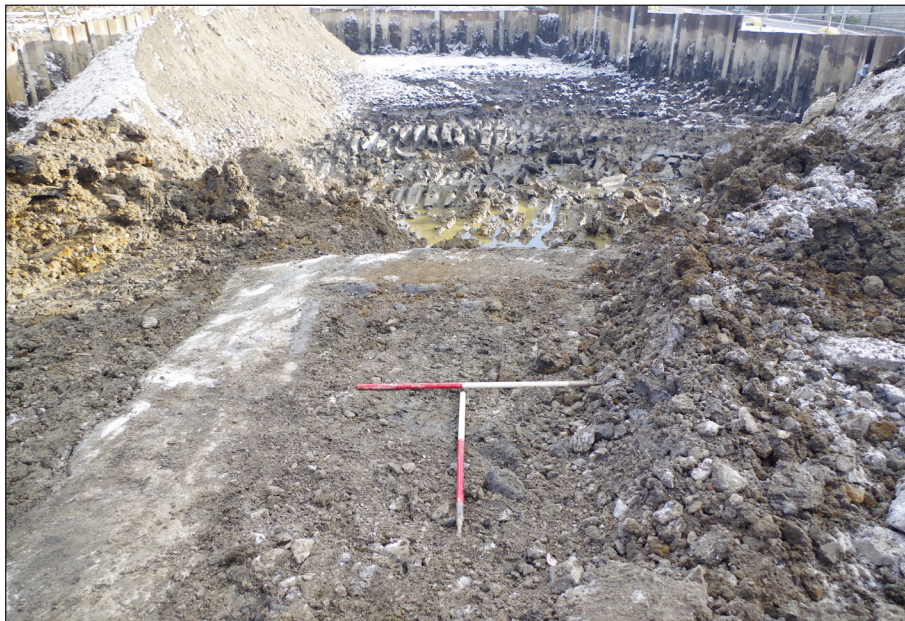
Concrete foundations of Riverside Ward (1035) cutting made ground and levelling deposits, view from the west (2 x 1 m scales)
